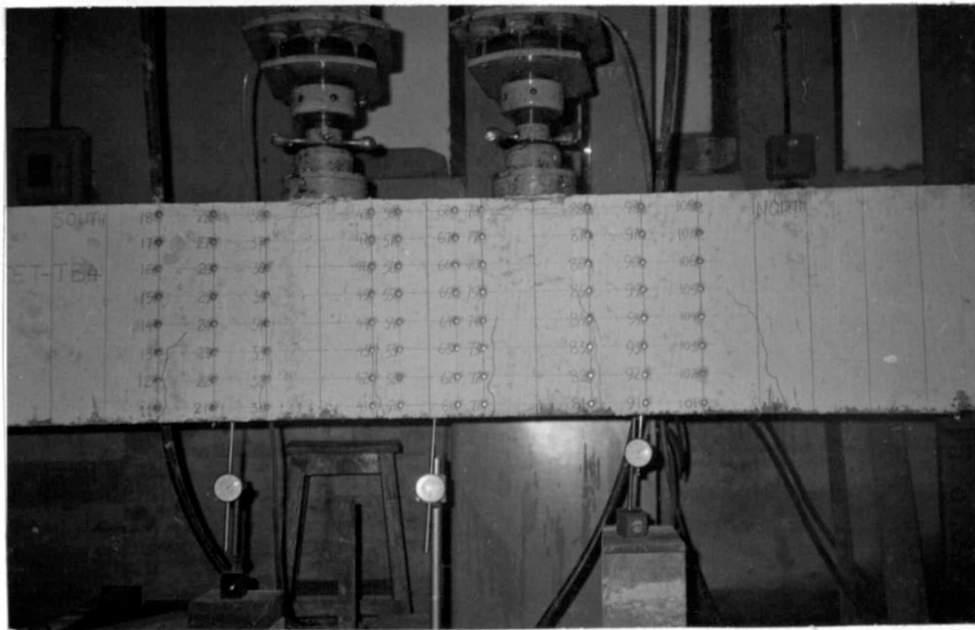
Beam CFT-TB4 at Start of Inclined Cracks
